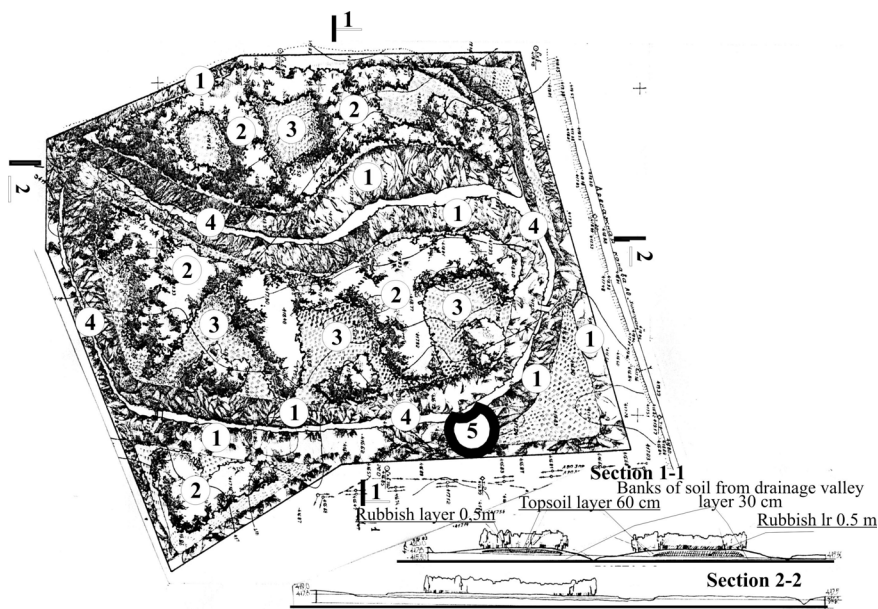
Master plan of quarry in Usolye Sibirskoye. 1) Slopes of islands – coasts of valley, 2) Birches plants, 3) Meadows, 4) Drainage channels, 5) Drainage well.
